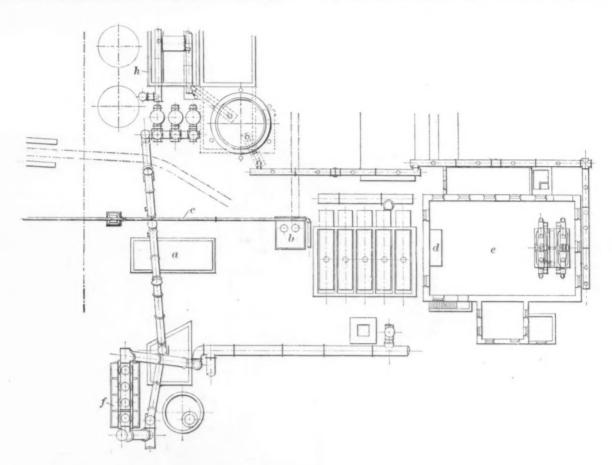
Six Hundred H.-P. Gas Engine Plant at Oberhausen.—b, Power Station for Coal Haulage.—c, Steam Pipe.—d, Switch Board—e, 600 H.-P. Gas Engine Driving Electric Plant of 3000 Volts.—f, Gas Washing Plant.—h, Purification Plant.
